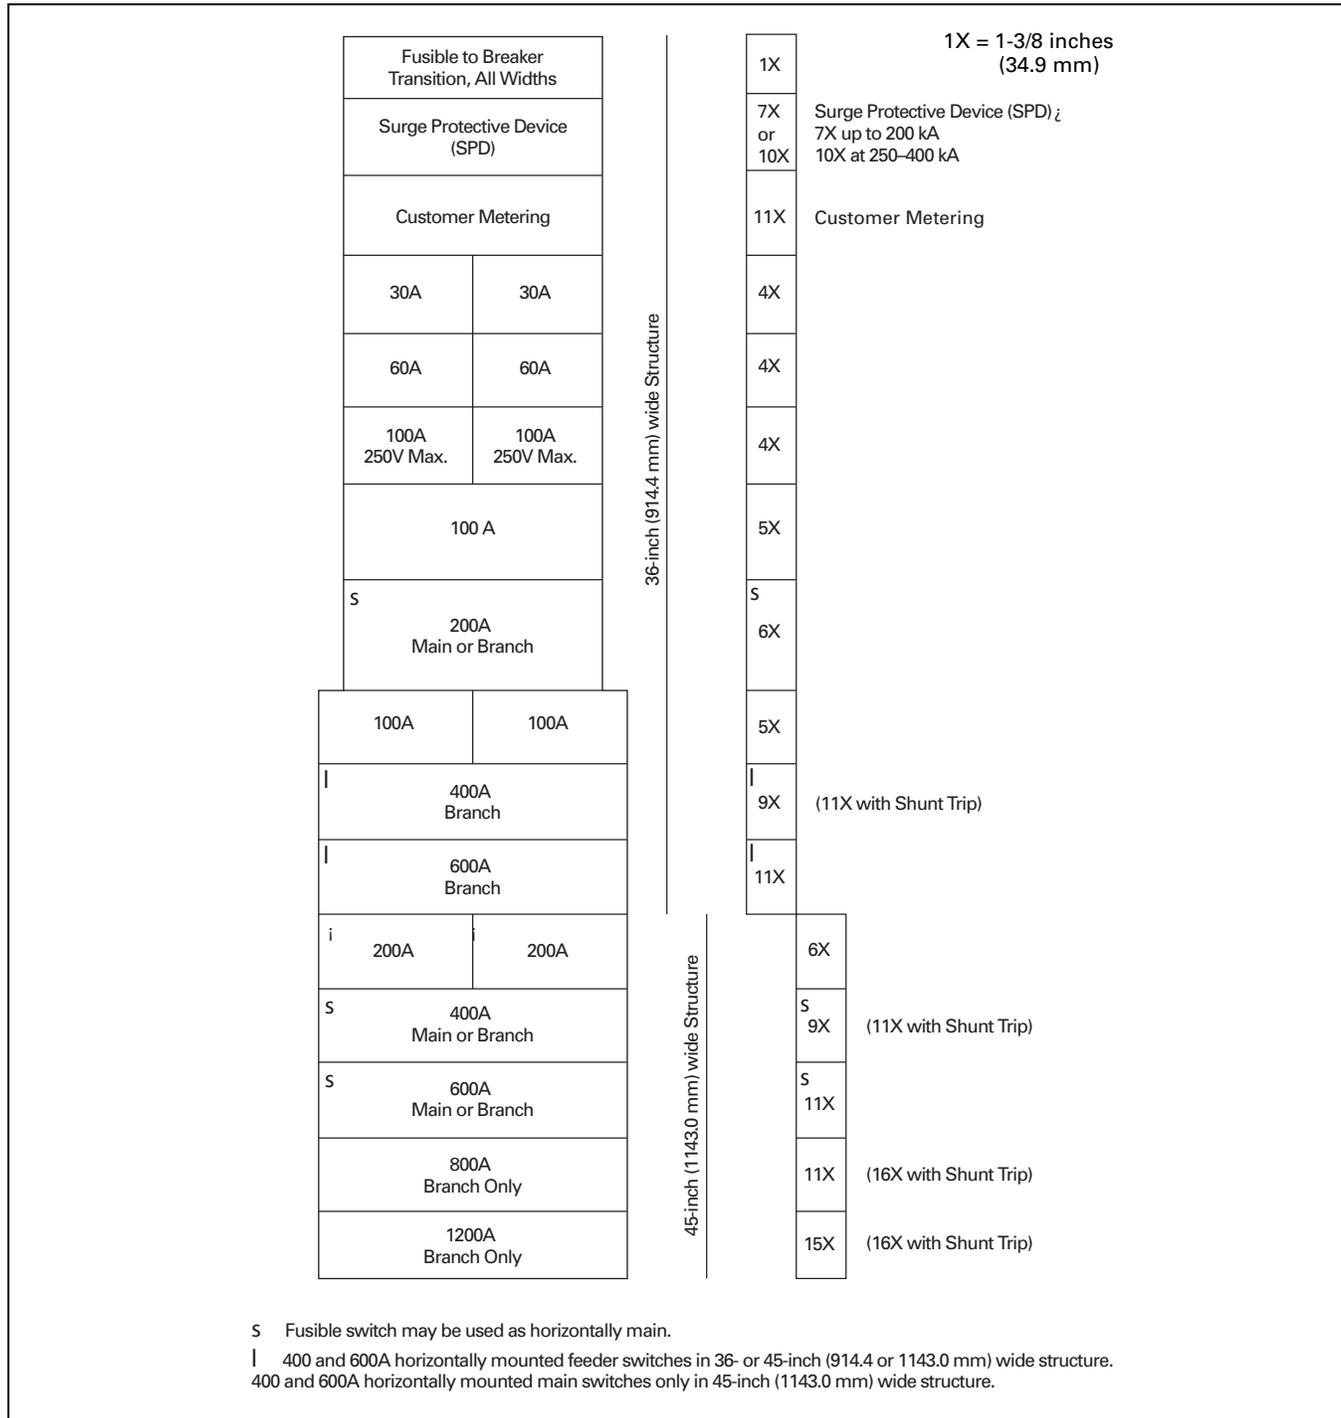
Fusible Switch “X” Space Requirements—Dimensions in Inches (mm)
